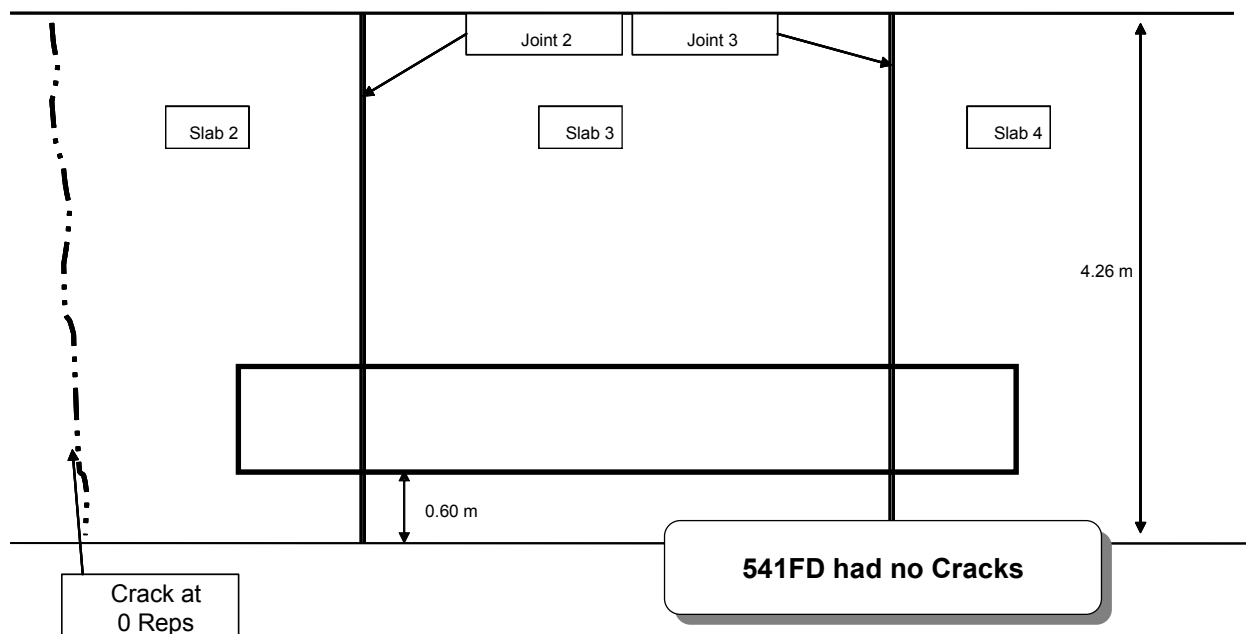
Crack pattern in slab (Section 541FD) after fatigue damage load application.(2)
